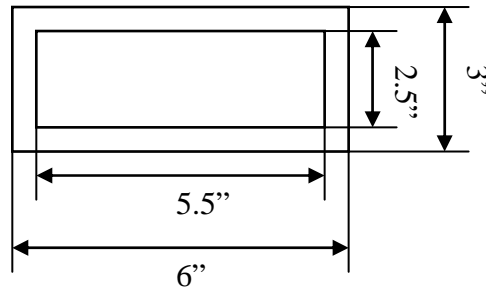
Sketch of the steel rail cross section for Design #5 (rectangular tube).
